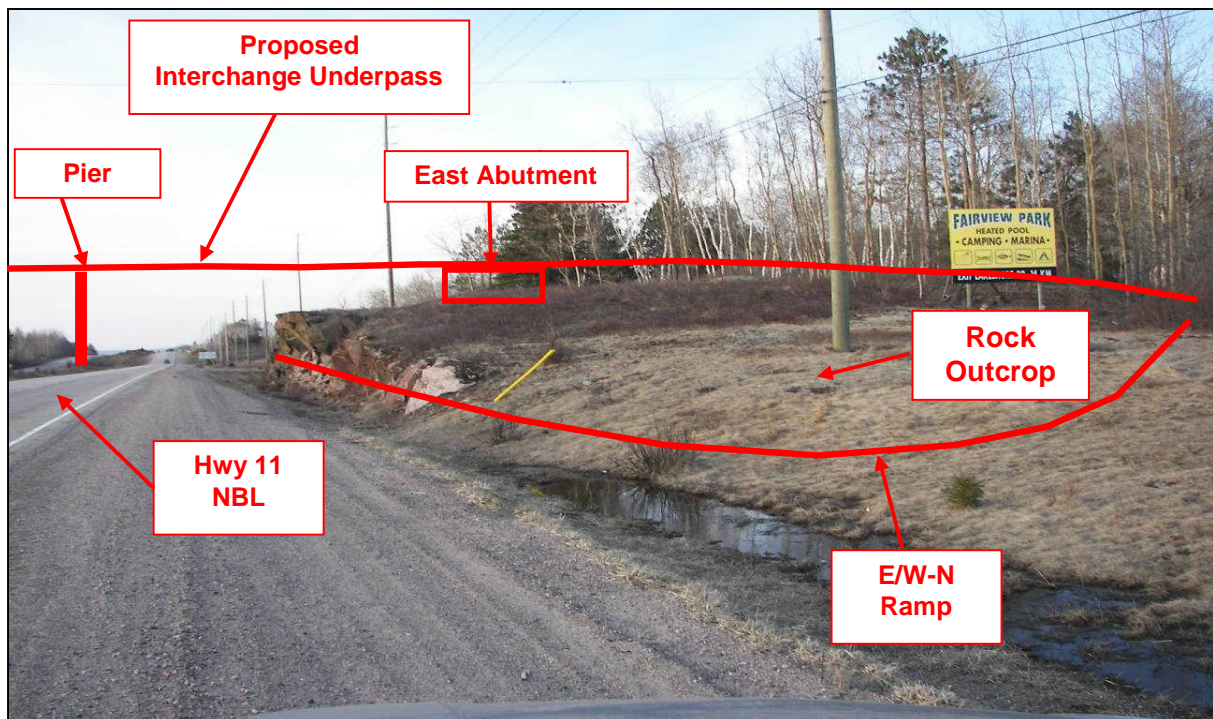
VIEW: Looking south from south shoulder of McCharles Line. Underpass site is about 100 m north of creek crossing of Highway 11. (April 17, 2008)
